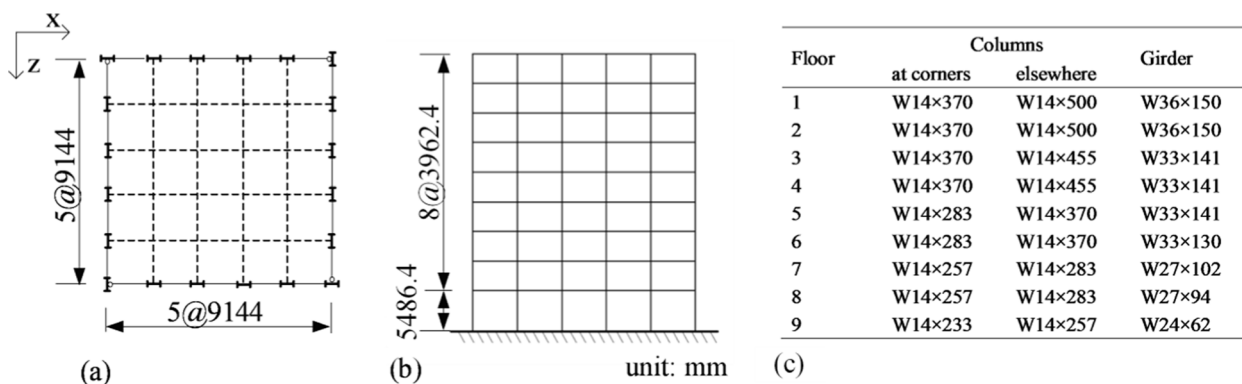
(a) Typical floor plan, (b) elevation, and (c) member sizes of the nine-story building.
